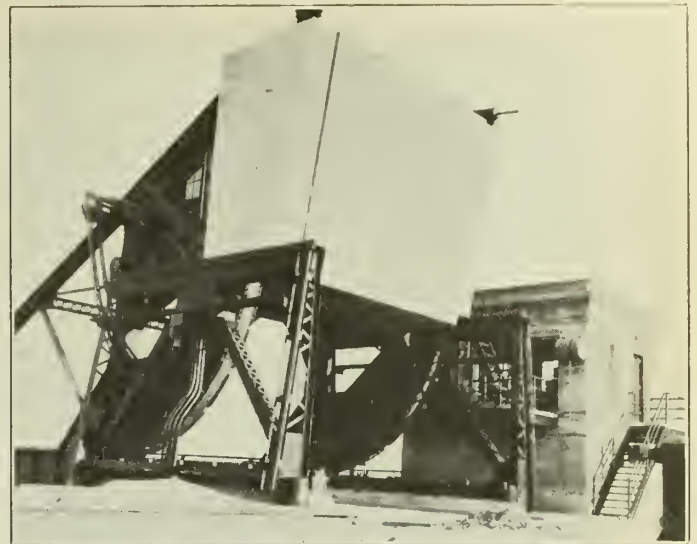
Bridge No. 3—Rear View of Bridge Closed.
